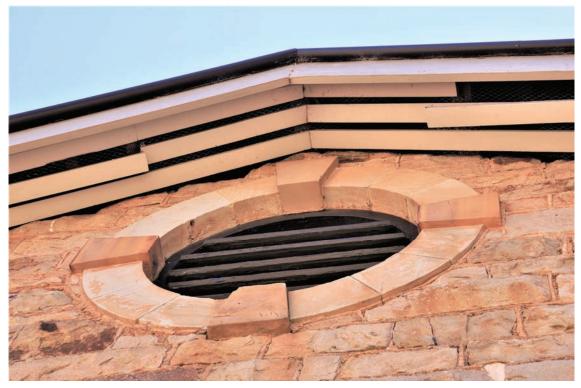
Barge boards hanging loose on the south elevation west gable of the rear pavilion.
